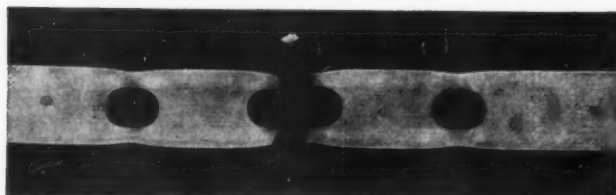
RUPTURE OF TEST SPECIMEN SHOWN IN FIG. 6
